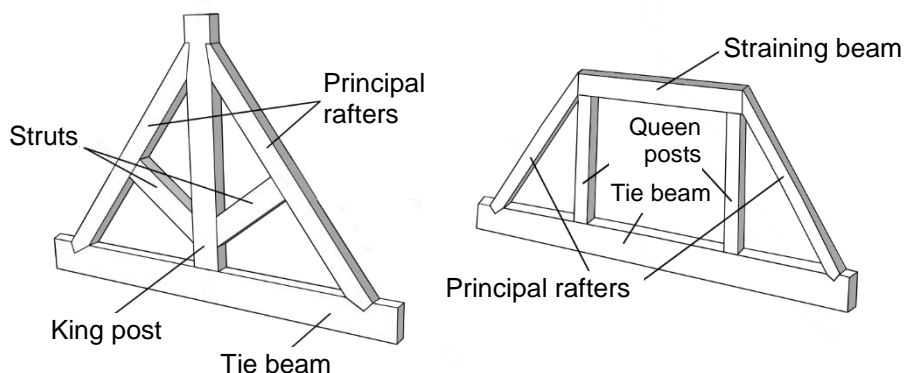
Configuration of two main timber roof trusses; King post (Left) and Queen post (Right) and their structural components ("Timber Roof Truss" 2014).
